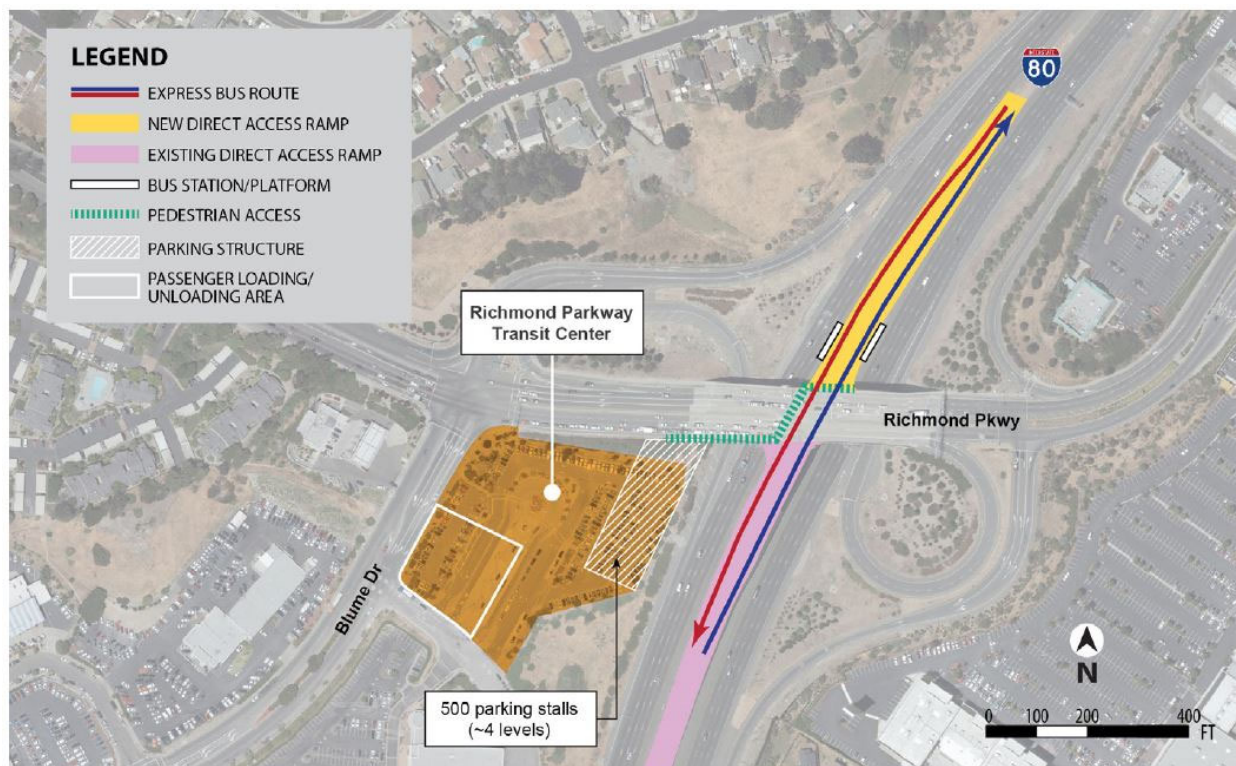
Richmond Parkway Transit Center Direct Access Ramps
